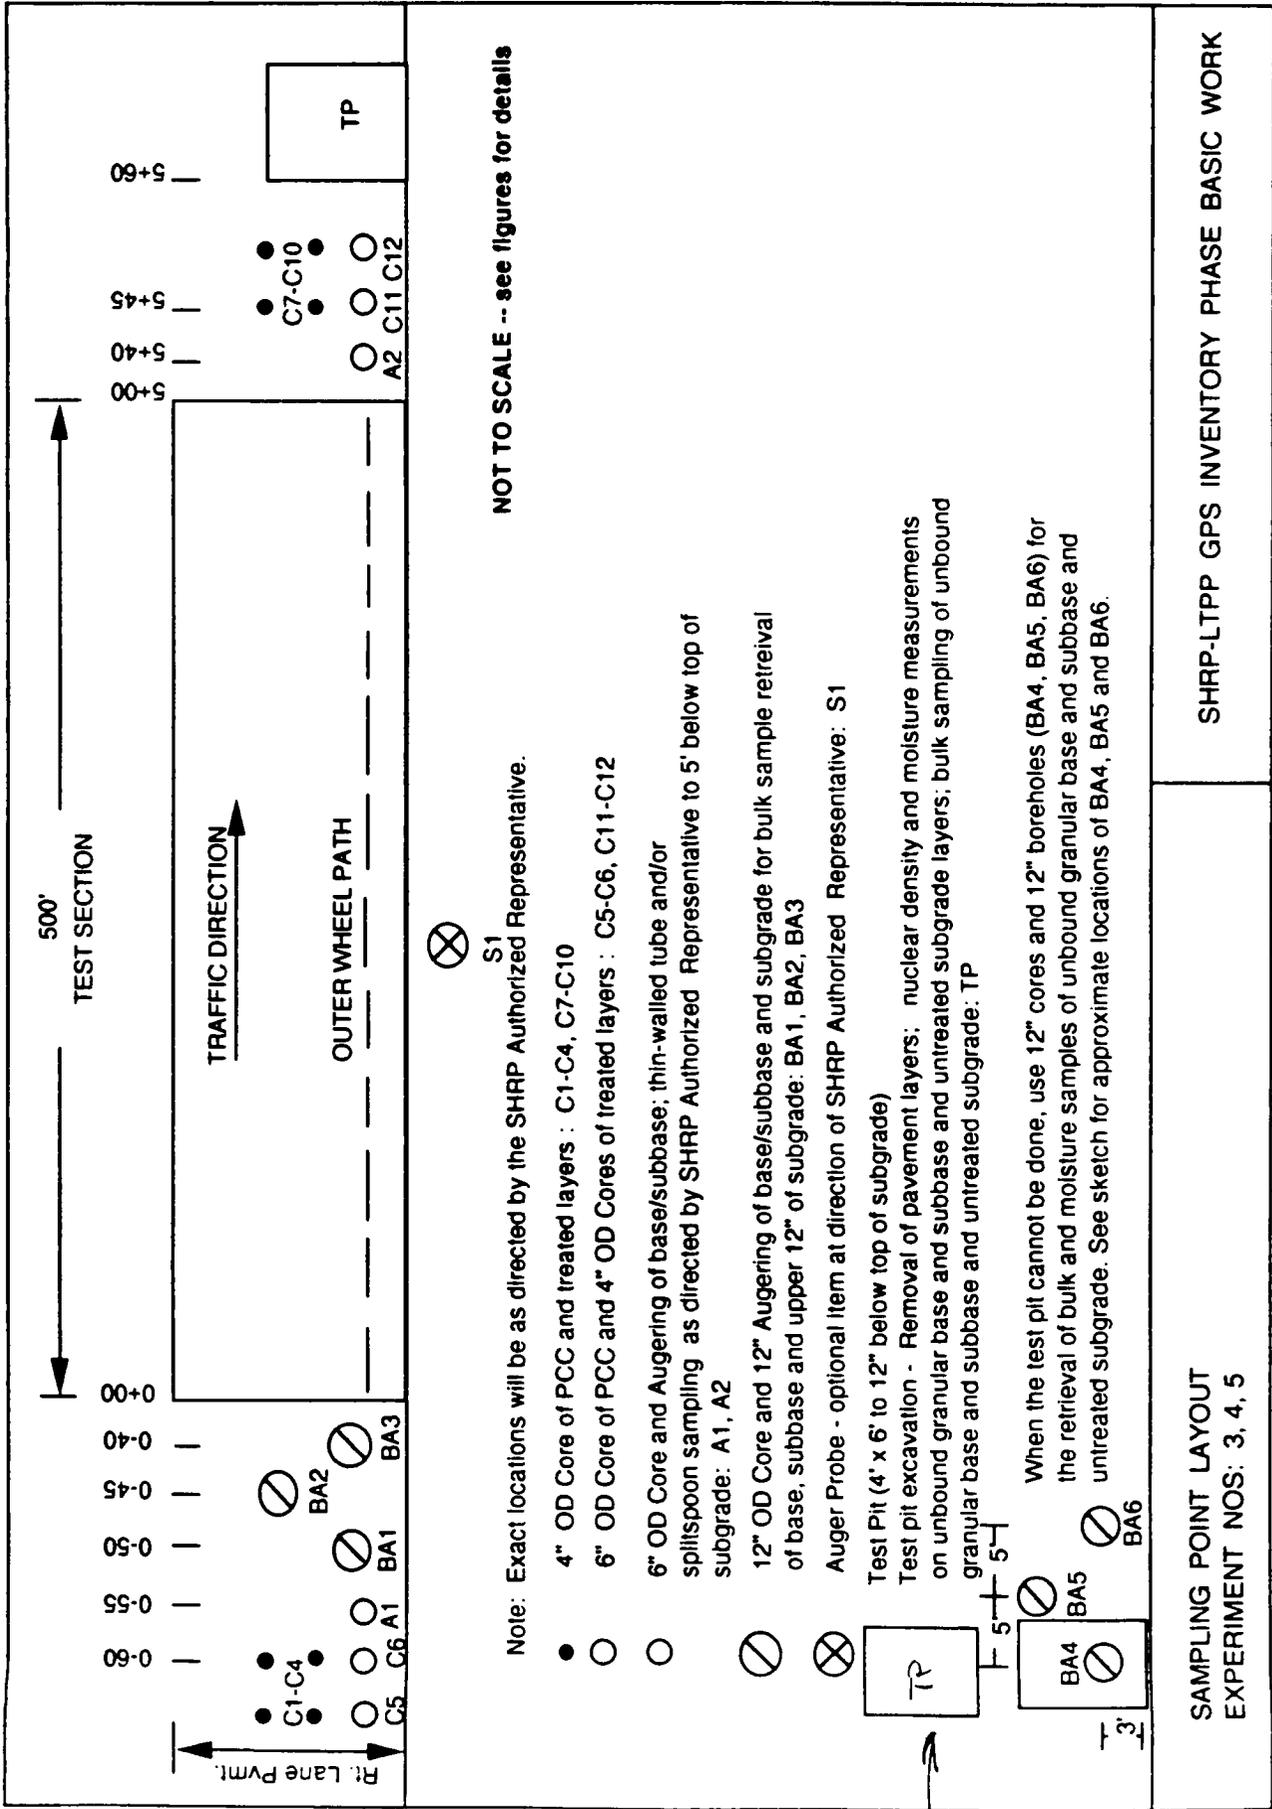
Typical Sampling Point Locations for GPS-3, GPS-4, GPS-5, and GPS-9 (Rigid) Pavements
